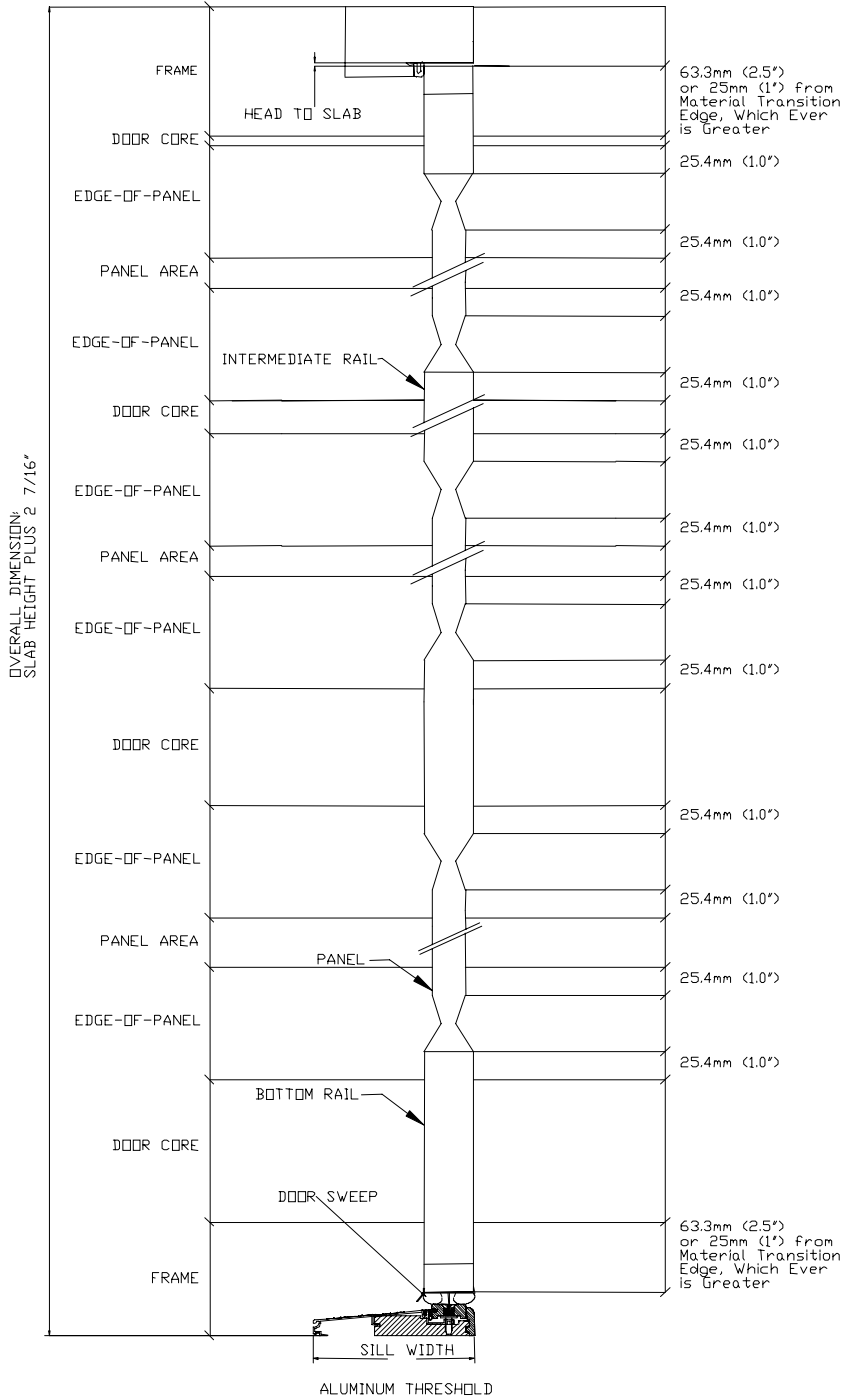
Exterior Steel/Composite Door System-Vertical Elevation in Wood Frame
